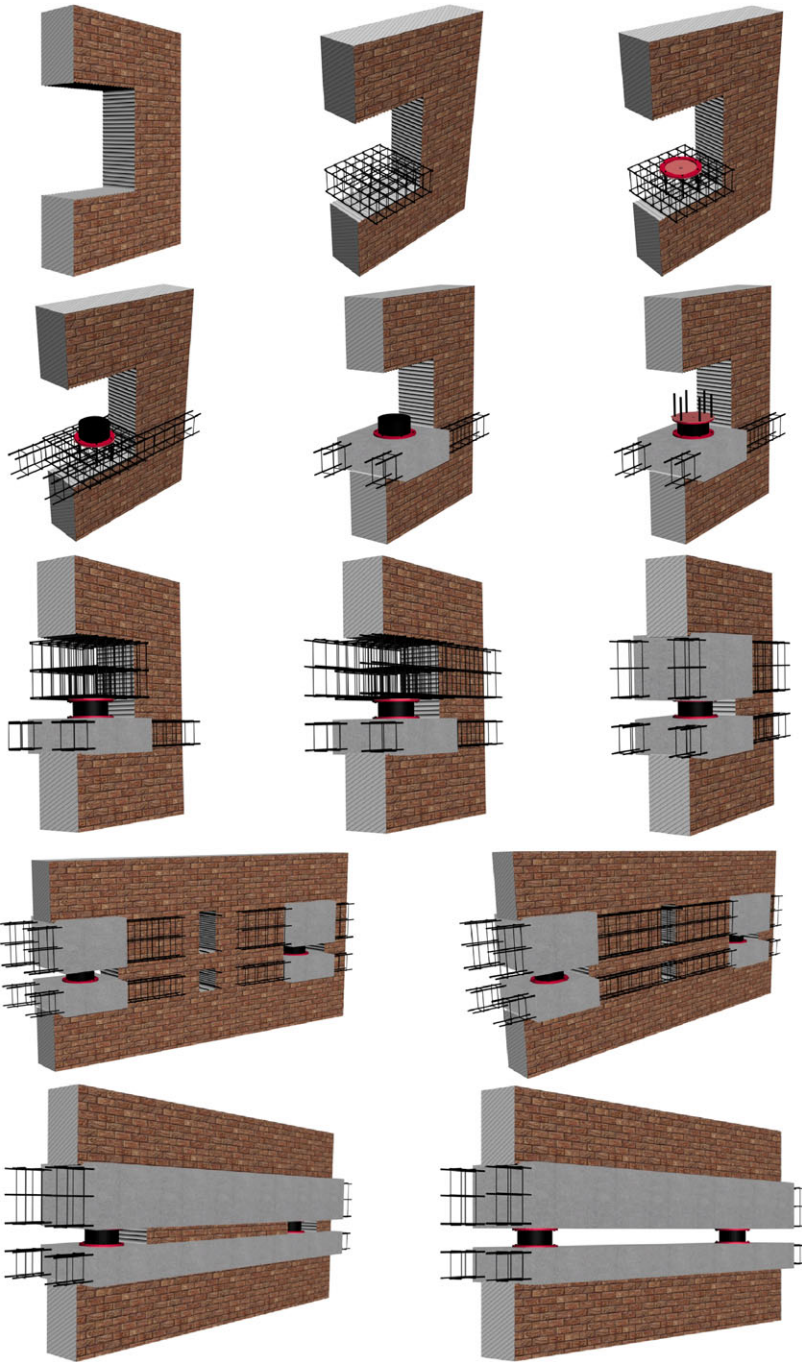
Stages of installation of seismic isolation system in the existing building with stone bearing walls
